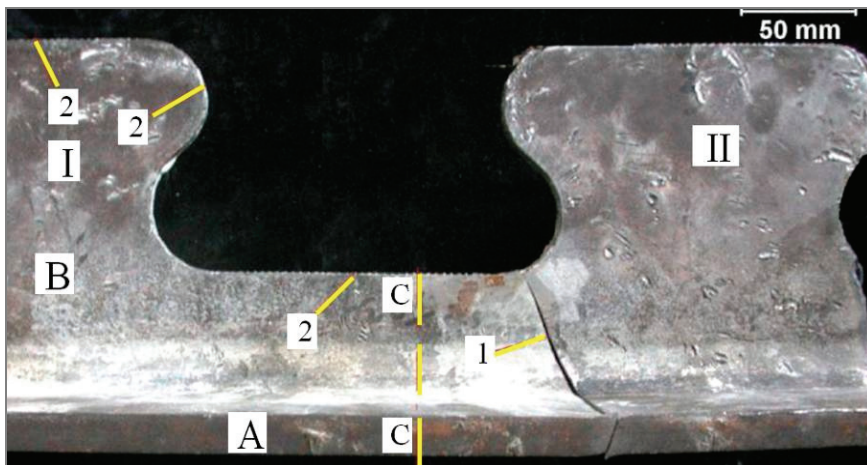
Macroscopic photo of the supplied specimen for testing. The view from side. A – Flange of a steel section. B – Steel web. C-C – intersecting plane with an aim to gain a macroscopic cross section. I – The left part of the cracked beam. II – The right part of the cracked beam. 1 – A crack throughout the entire cross section. 2 – The outer surface parts of the web B with evidence of grinding
